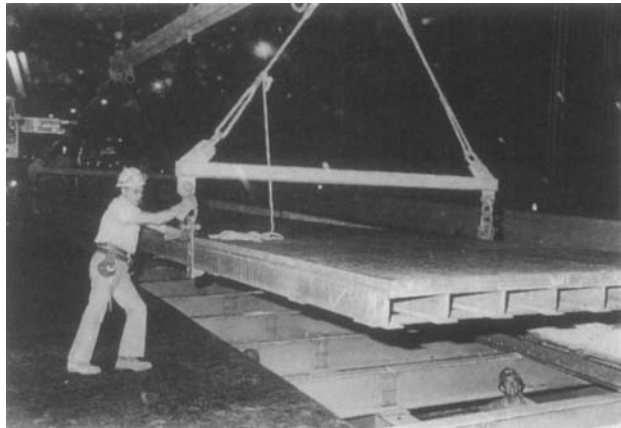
Steel orthotropic deck was chosen for replacement of second level deck on the George Washington Bridge.
